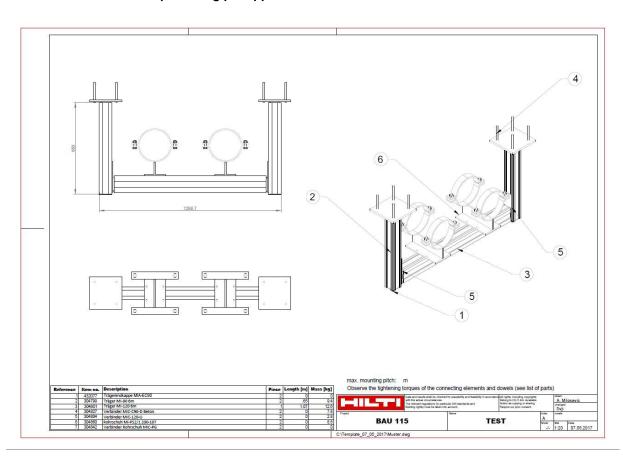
Sample AutoCAD 2D / 3D shop-drawing
